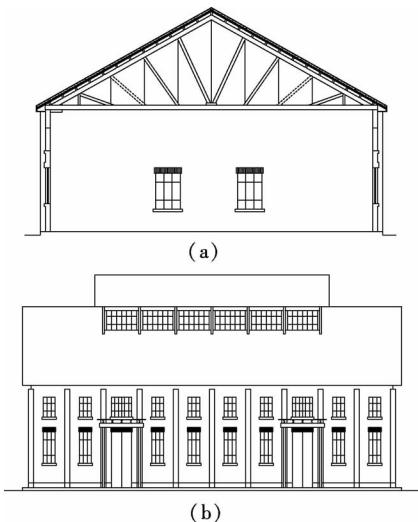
Schematic diagram of Xijindu exhibition hall. (a) Elevation of the East; (b) Elevation of the North
